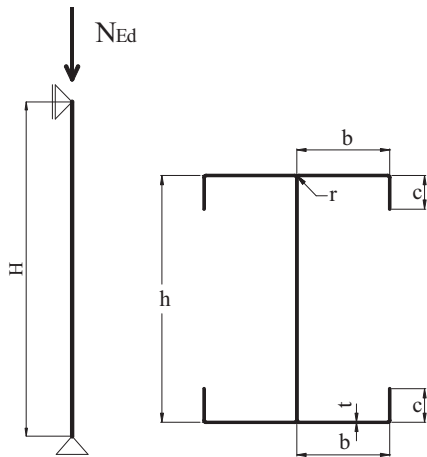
Overall dimensions of internal wall stud and cross-section
